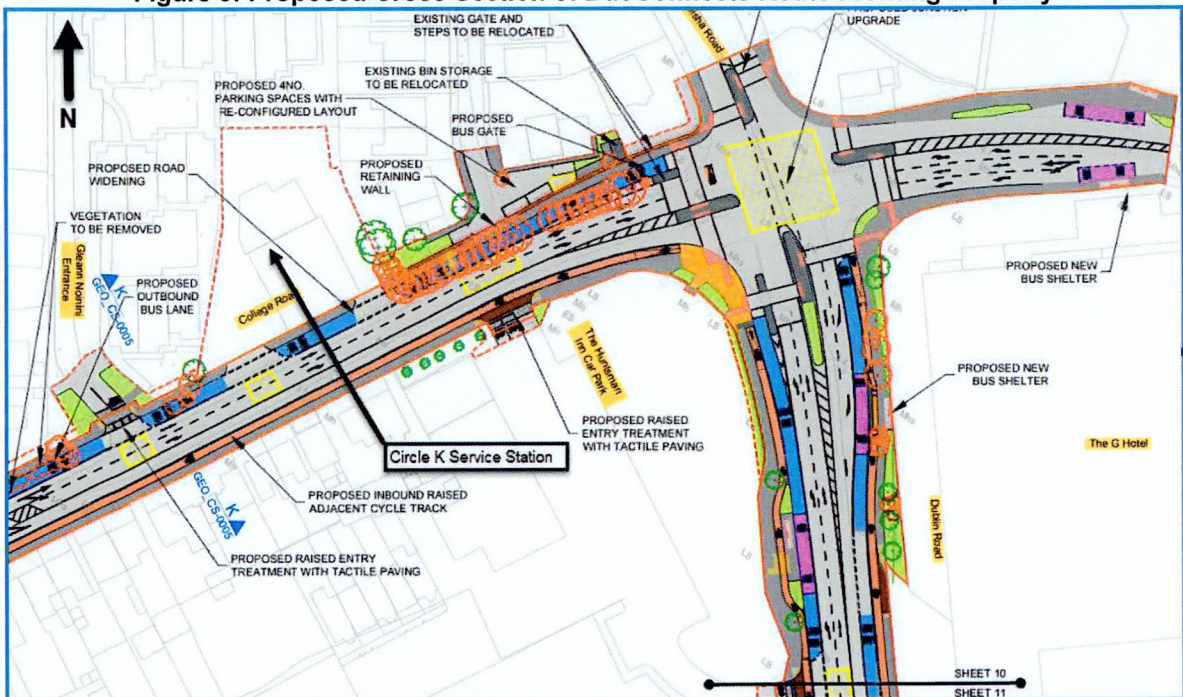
Plan View of Proposed BusConnects Scheme in the vicinity of Circle K College Road
